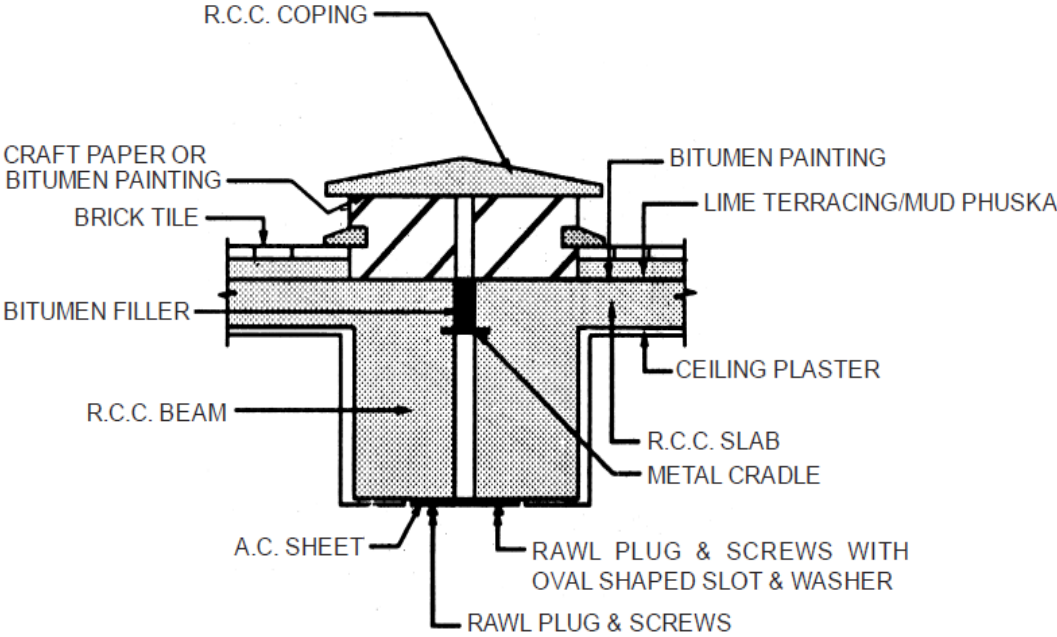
Details of Raised Type Expansion Joint at Roof
